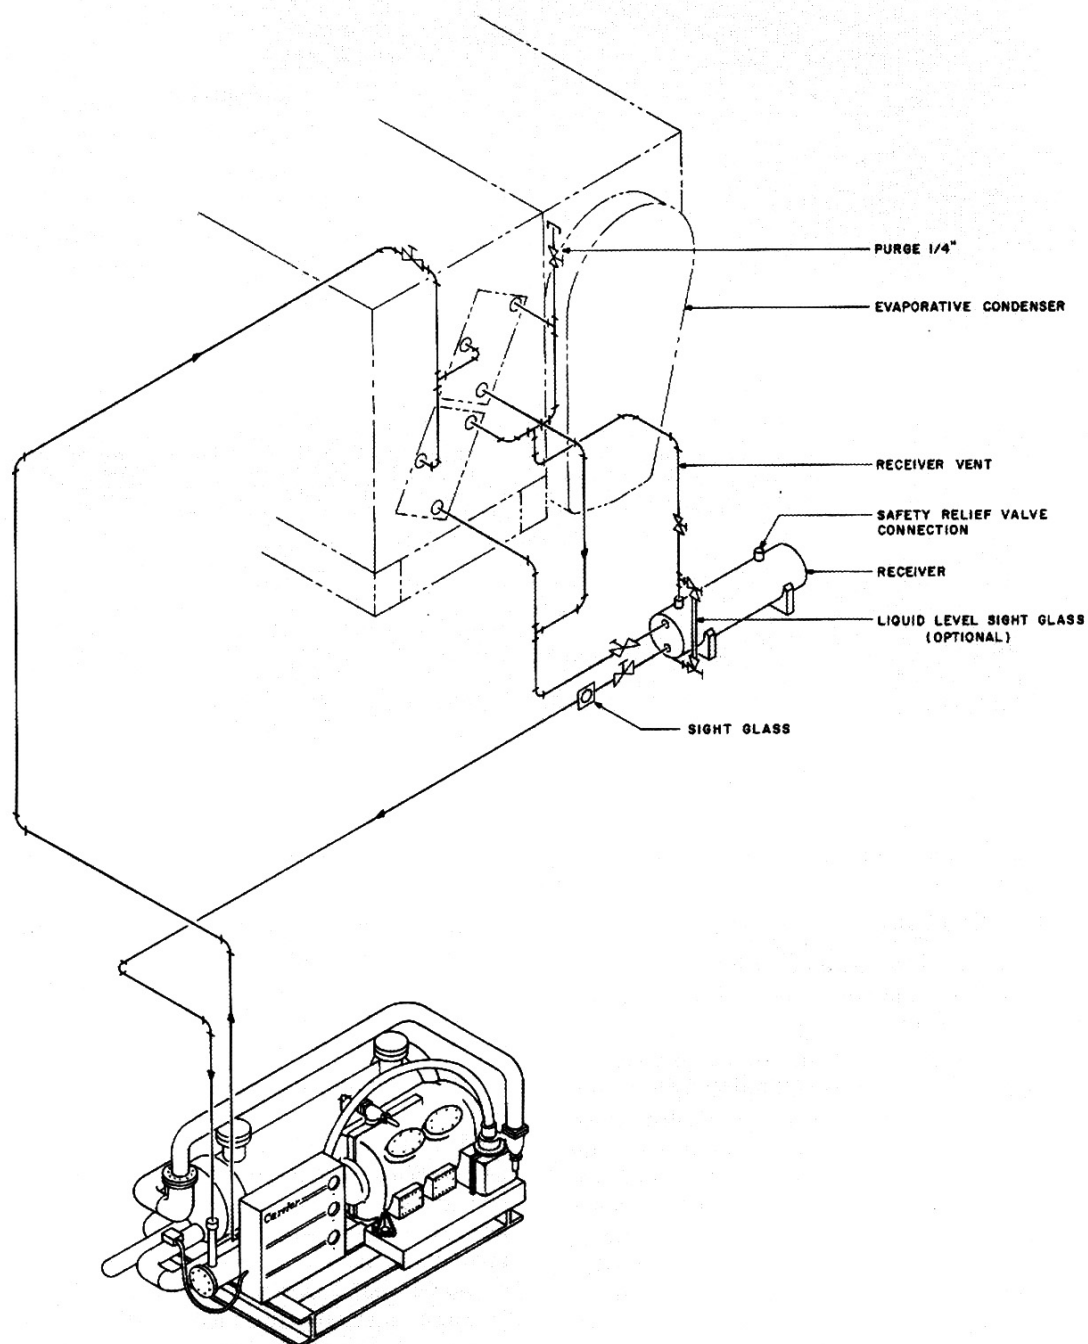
Dry Expansion Reciprocating Liquid Chilling Package with Evaporative Condenser
